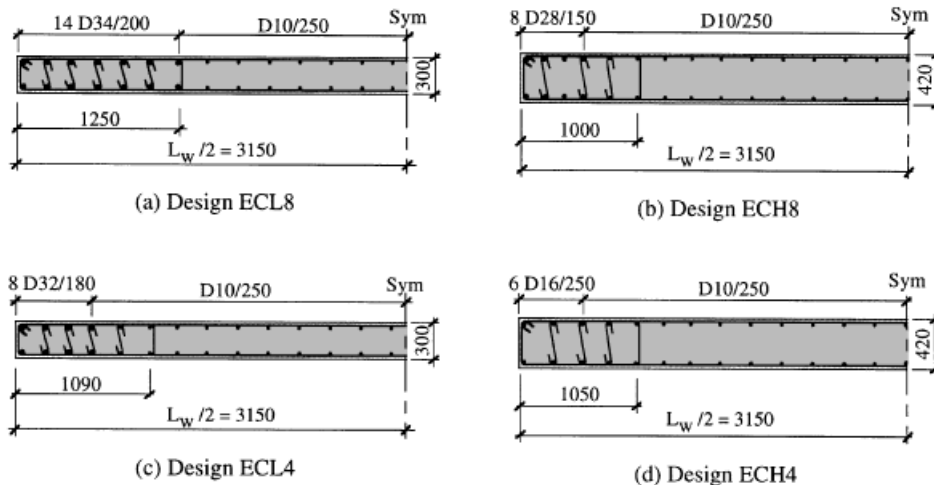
Details of cross-sections at the base of the walls designed according to EC 8
